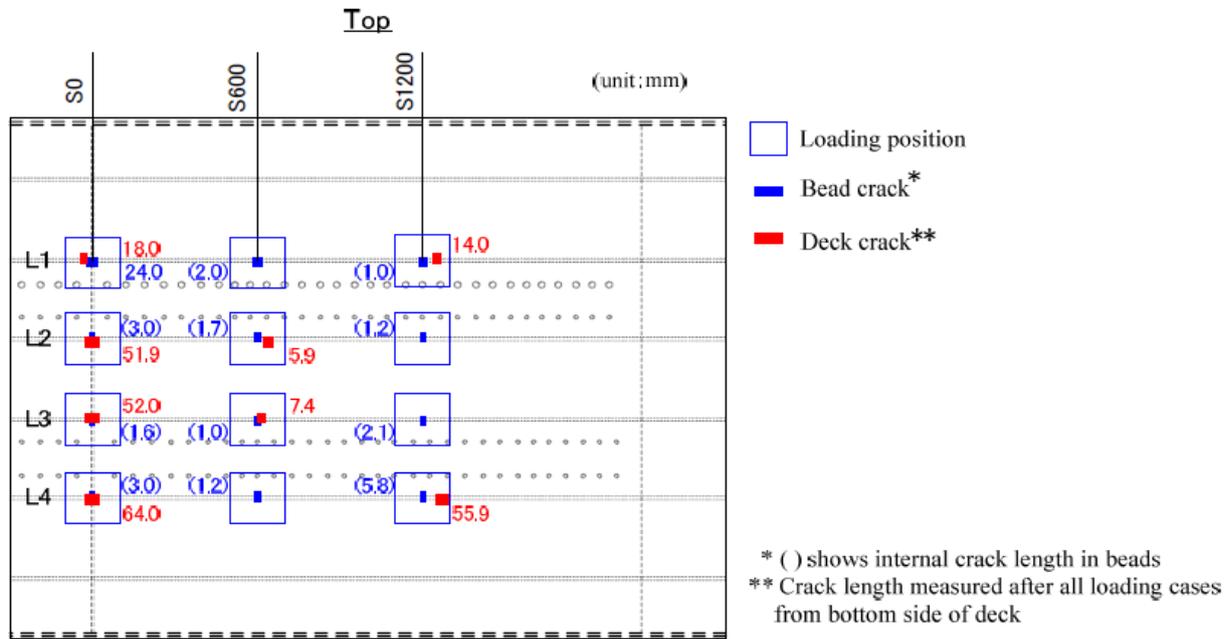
Crack distribution (after generation of bead-penetrating crack).
